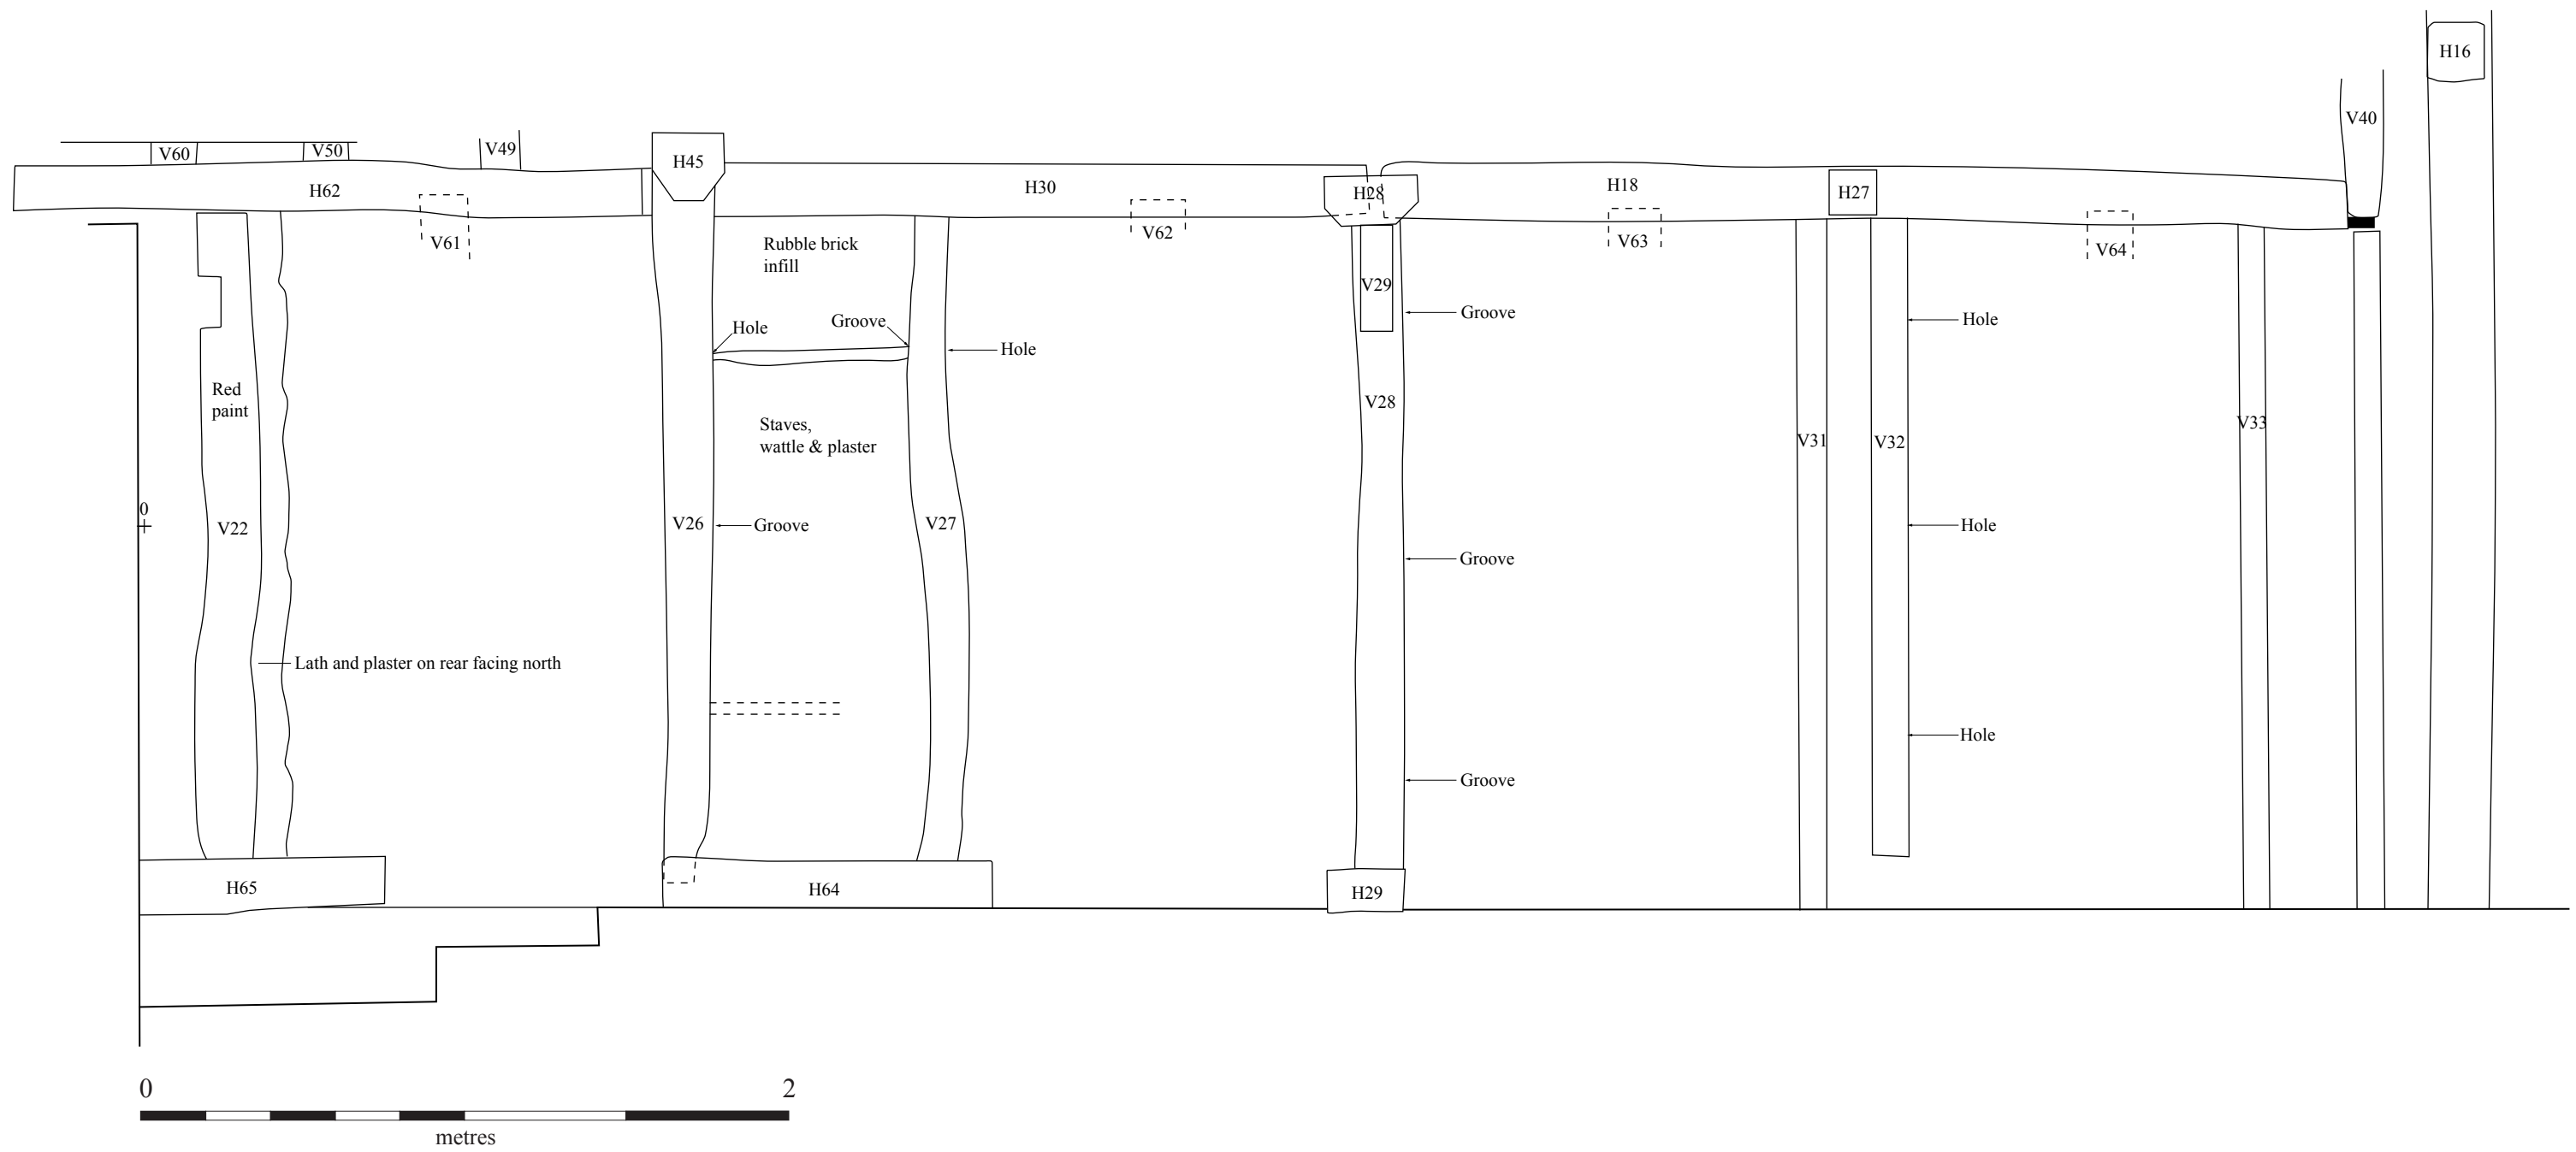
No. 5 Peas Hill, South facing elevation (scale 1:20)
